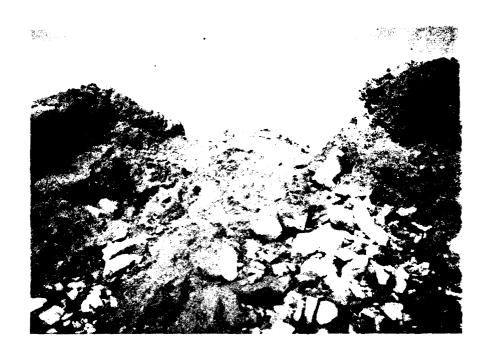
Wash-out downstream looking upstream towards working platform at station 4+60 (February 29, 1984)
